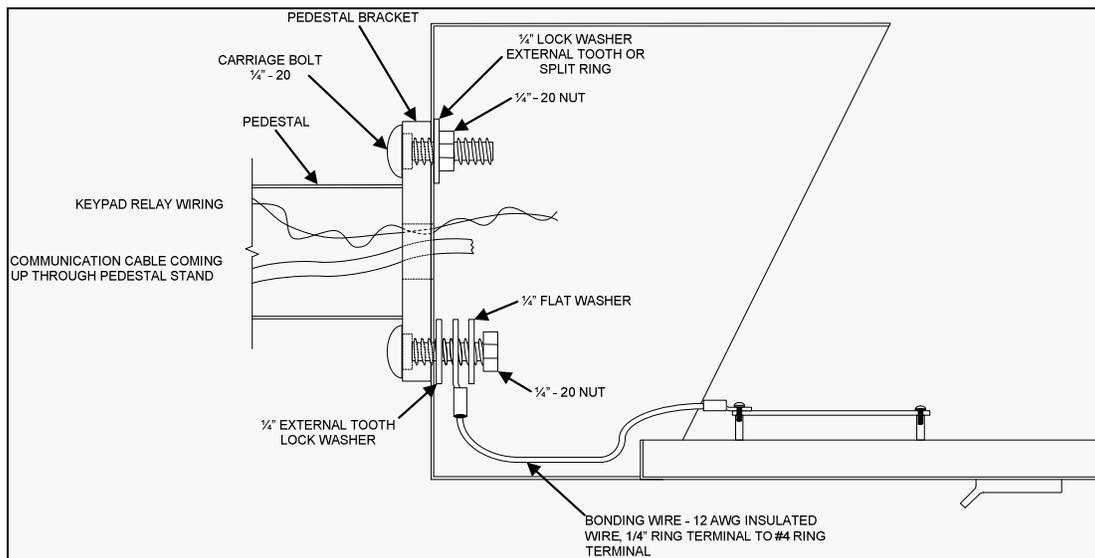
Enclosed Keypad (3200, 3200i, 1600, DaVinci) Surface Bonding Example
